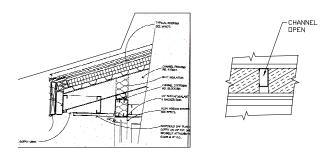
Detail of Leakage Area Into Ceiling Plenum
